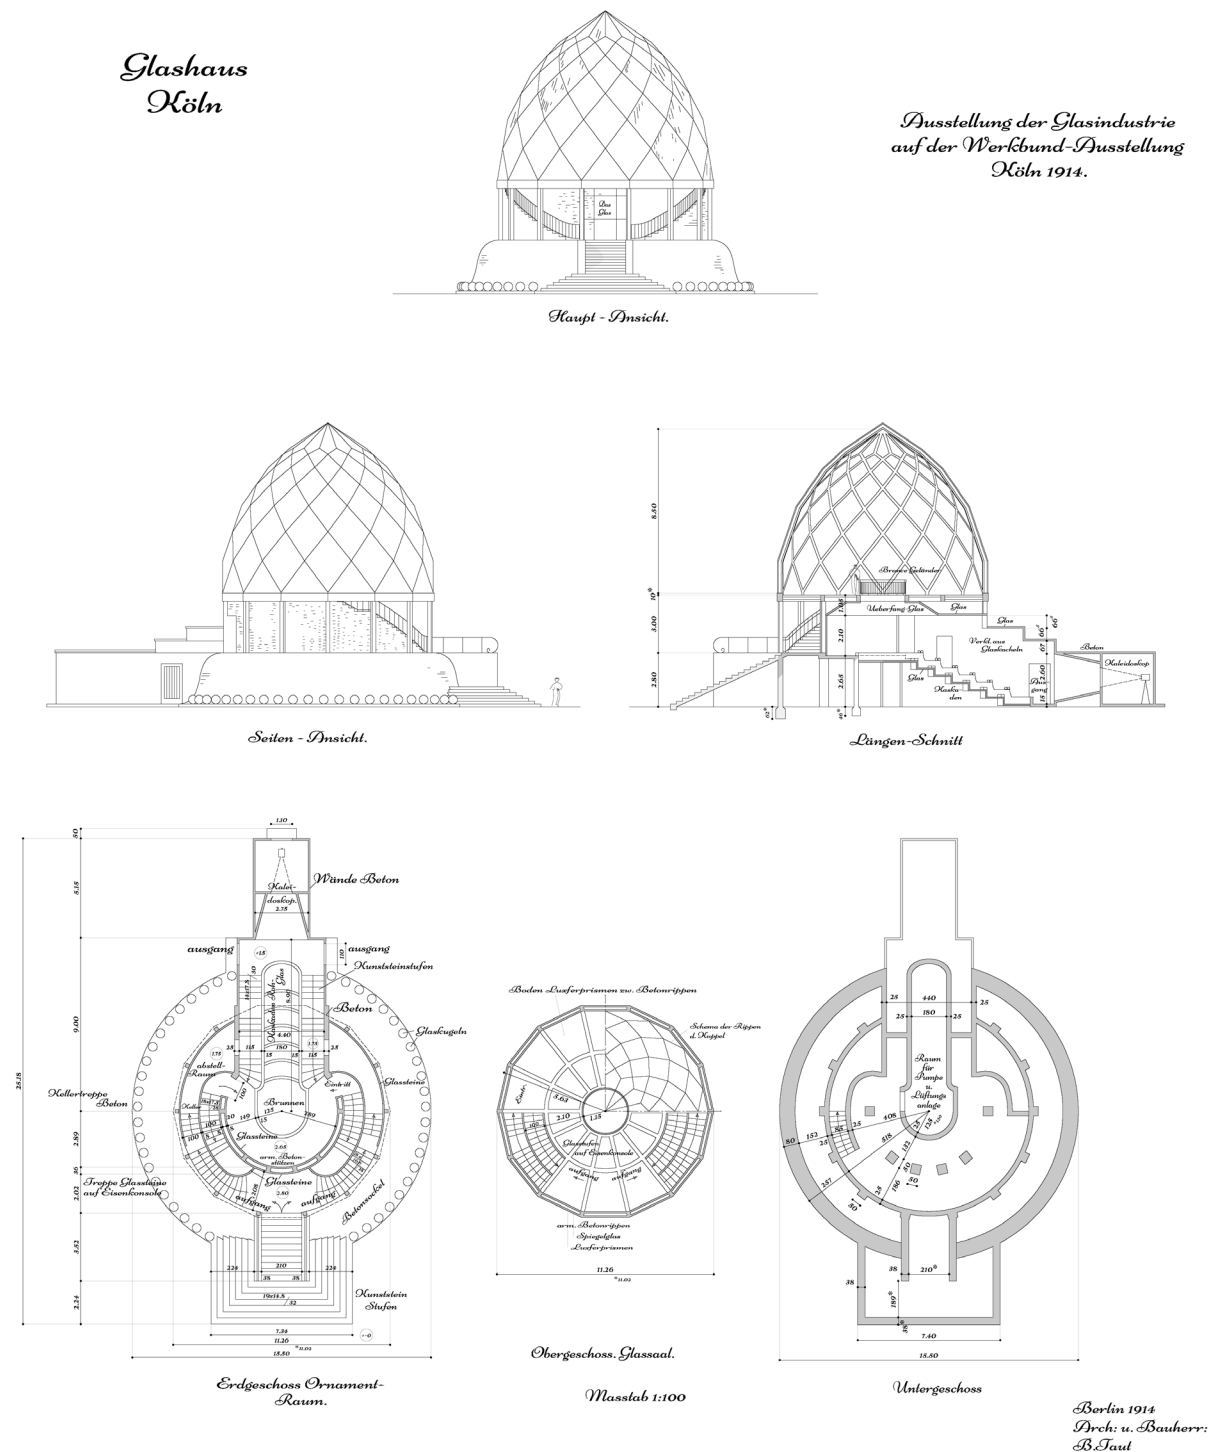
Reconstruction of the building plans of Bruno Taut's Glashaus based on Engelbert et al. (1996)
